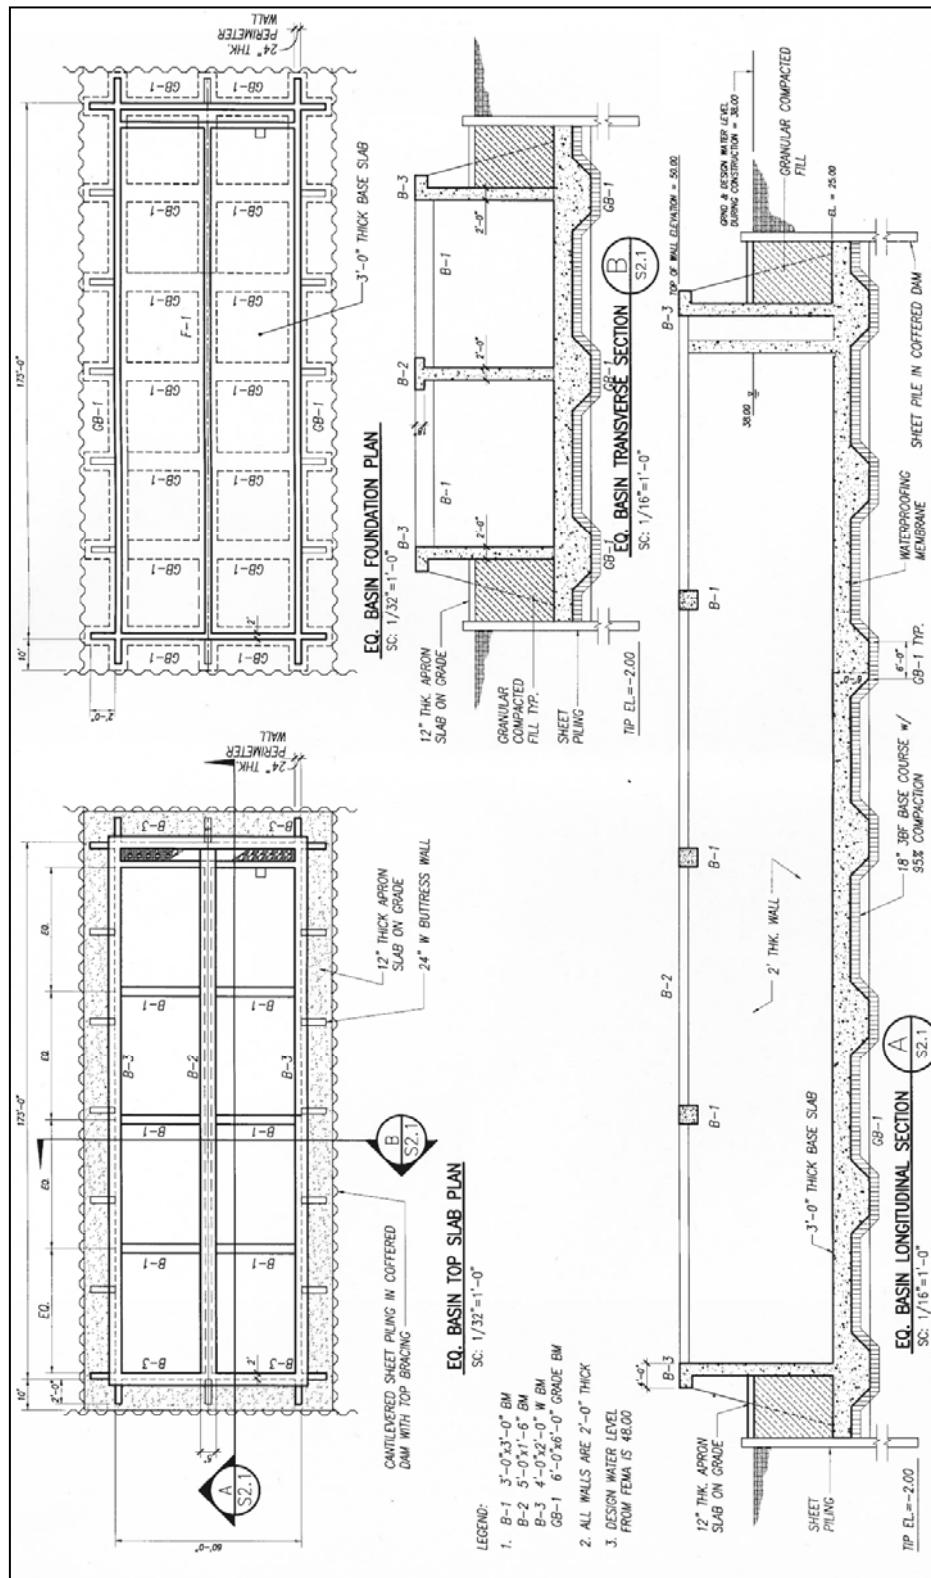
Option 3A: Structural Foundation – 0.84 MG EQ Basin at Effluent Holding Pond
